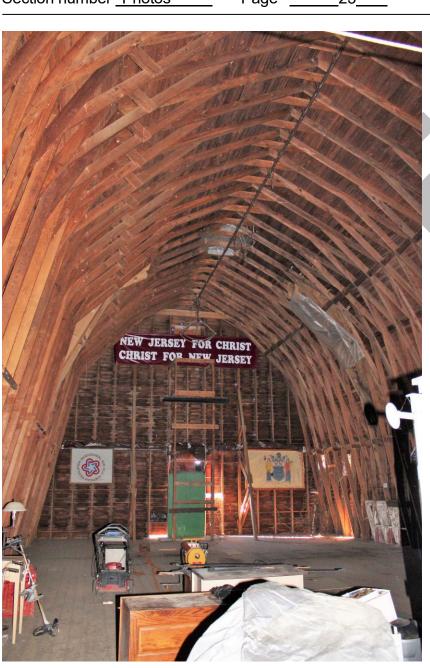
View of the Shawver truss system and exposed framing on the upper level of the dairy barn, camera facing northwest.
